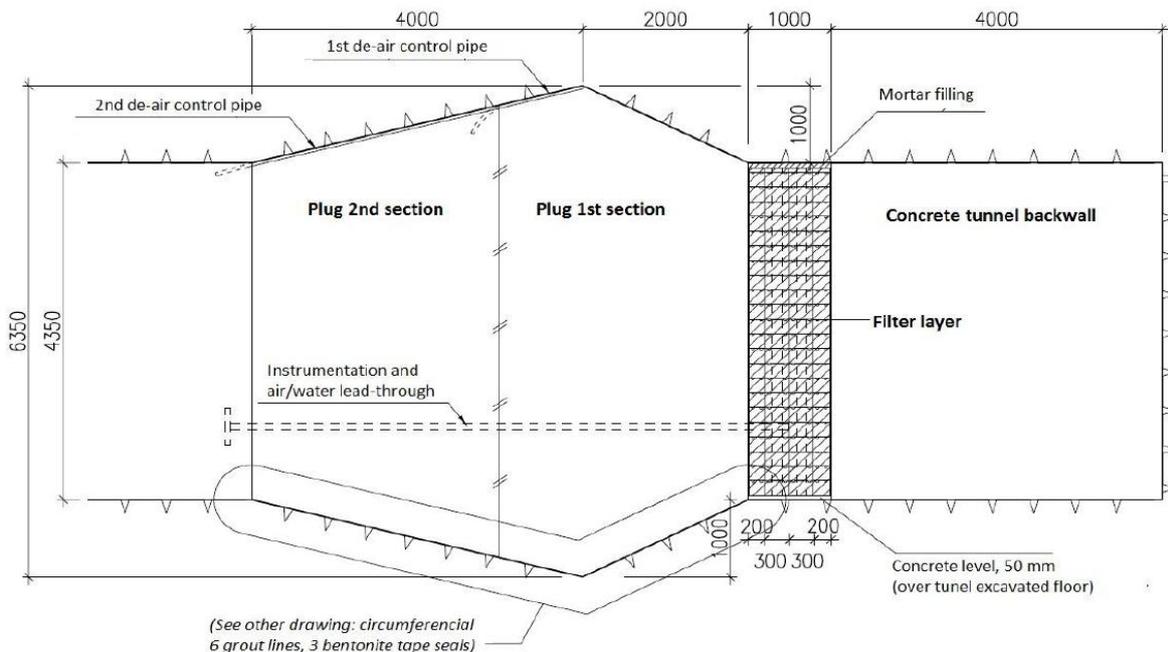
Detailed design of POPLU (January 2014), showing the two plug parts to be cast in the excavated slot (wedge shape), the filter layer for water injections behind the plug, and the concrete back wall at the tunnel face. ©Posiva
